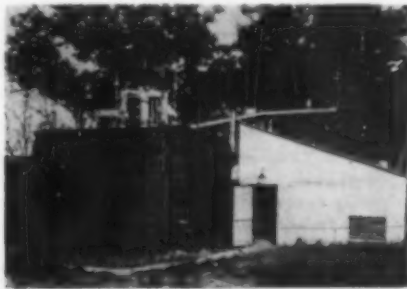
An earth-filled revetment is used as an explosion resistant barricade. The walls are 4 ft. thick at bottom, 2 ft. at top.
